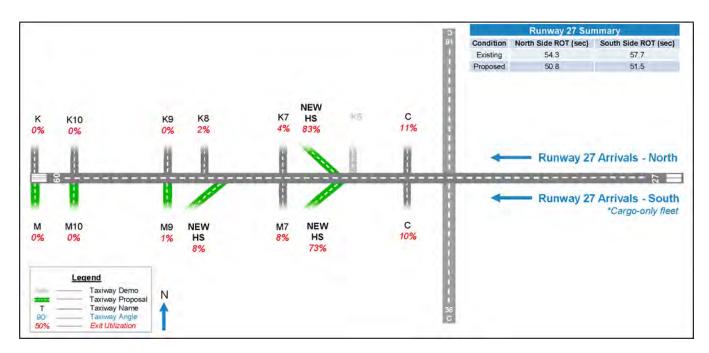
RUNWAY 27 POTENTIAL EXIT IMPROVEMENTS
